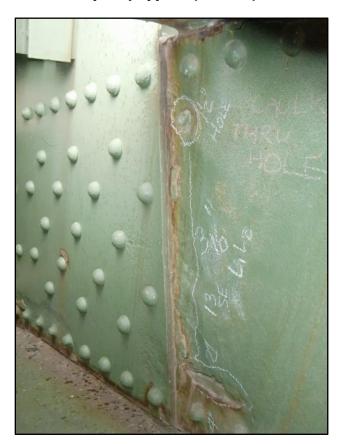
Two Perforation &  $^3/_{16}$ " Section Loss on North Web Plate, SE  $L_1L_2$ , Span 13.
